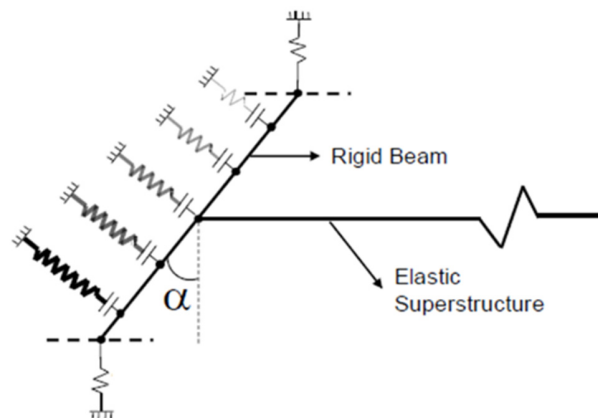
Abutment modeling detail: backfill soil springs (Kavianijopari, 2011).
